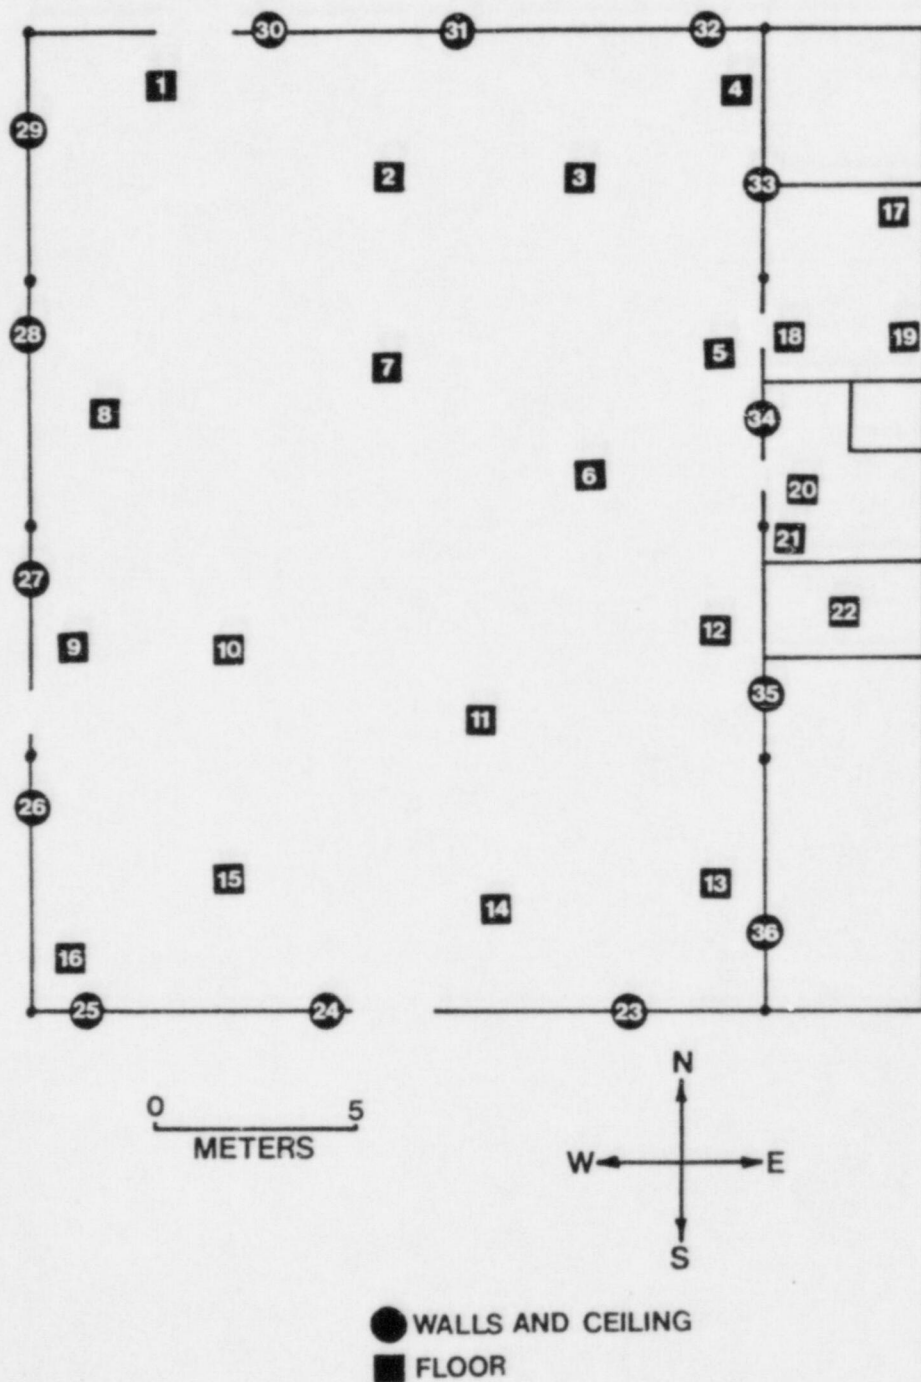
Floor Plan of the High Temp Building Indicating Locations of Measurements and Smears
